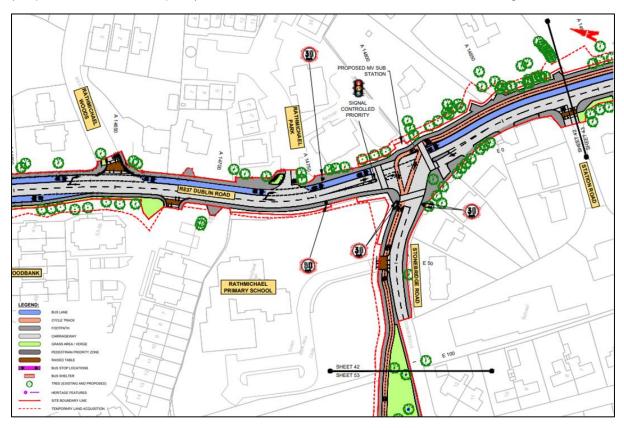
Extract from General Arrangement Drawing at Dublin Road & Stonebridge Road (Sheet 42)
